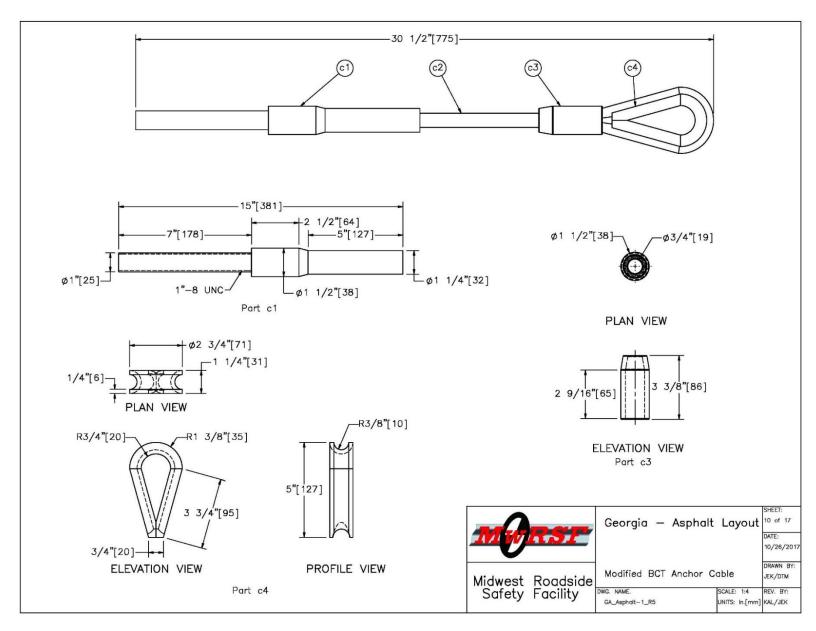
Modified BCT Anchor Cable Detail, Test No. GAA-1
